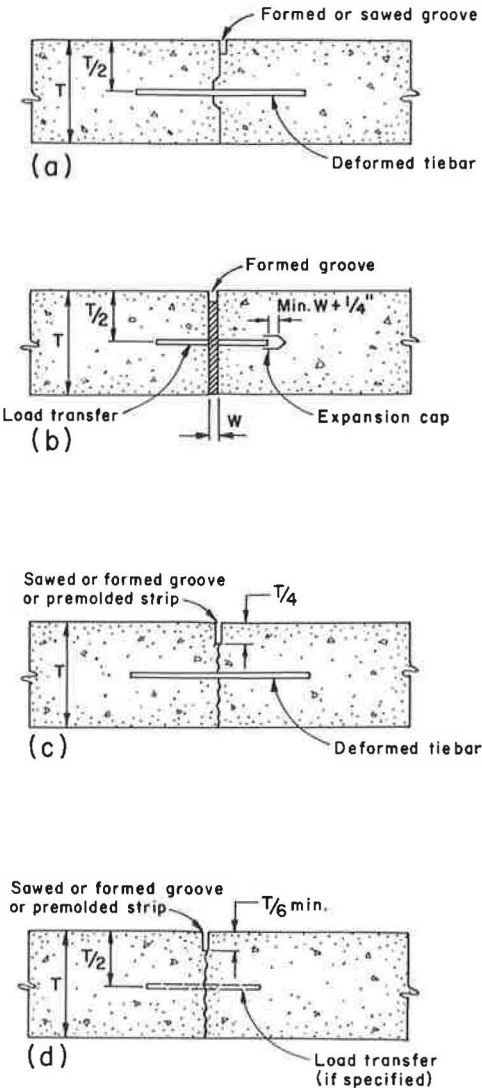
Basic types of concrete pavement joints: (a) construction joint, (b) expansion joint, (c) longitudinal center joint and (d) contraction joint.
